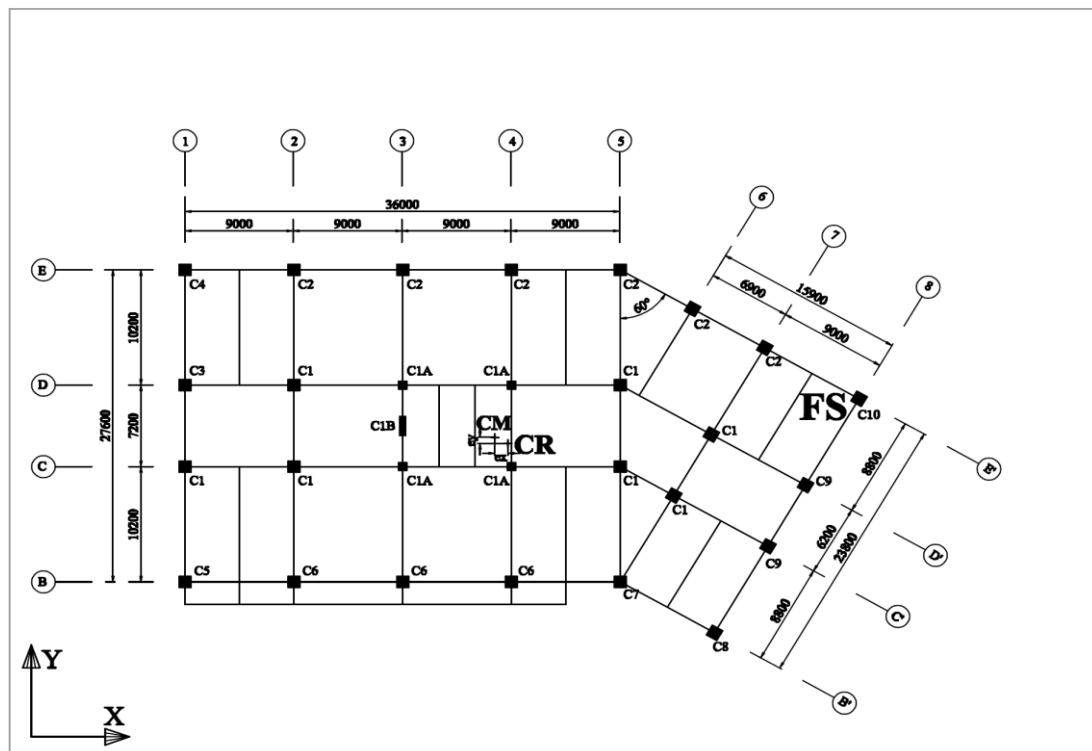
Plan layout of the columns for the upper 17 storeys of irregular 20-storey, multi-bay RC building (all dimensions are in millimetres).
